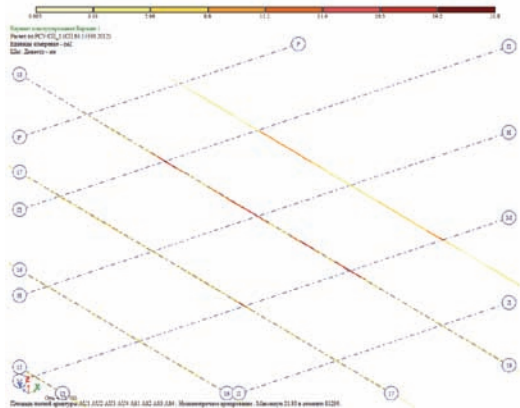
Required reinforcement in beams 40x80 mm (fragment)
